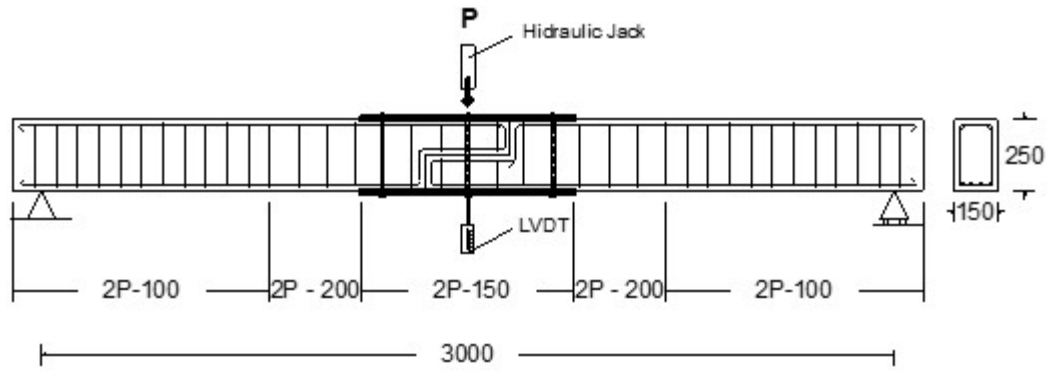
The second beam with steel plate in top and bottom in connection or BC-1 (unit in mm)
